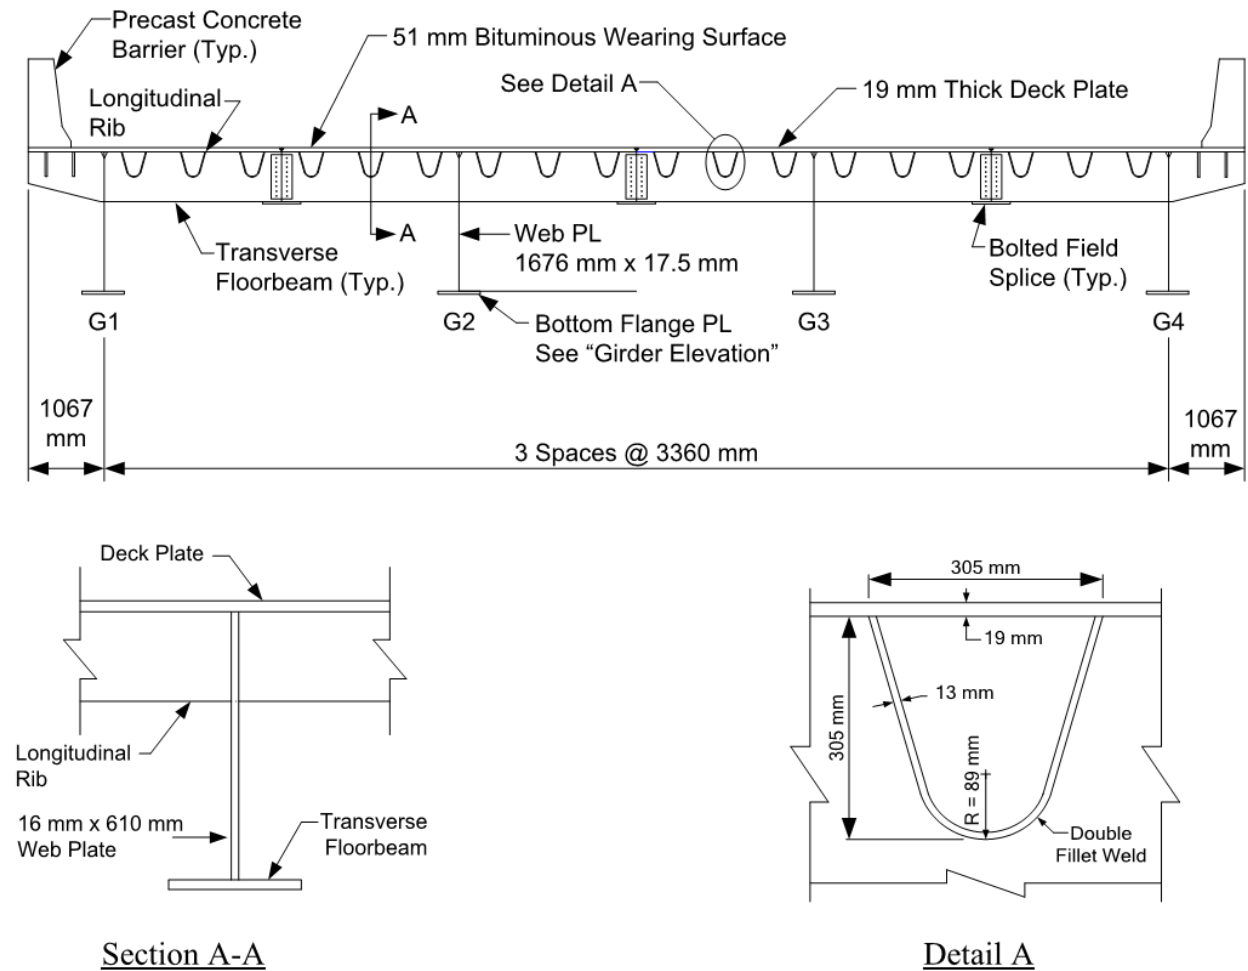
Orthotropic deck and I-beam steel bridge.
